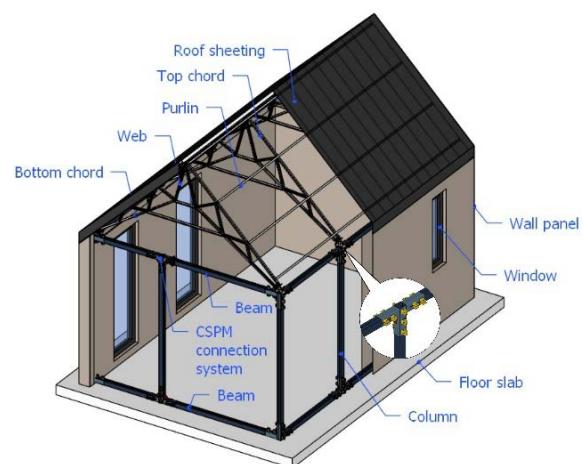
Typical prefabricated instant steel house with the CSPM connection system
